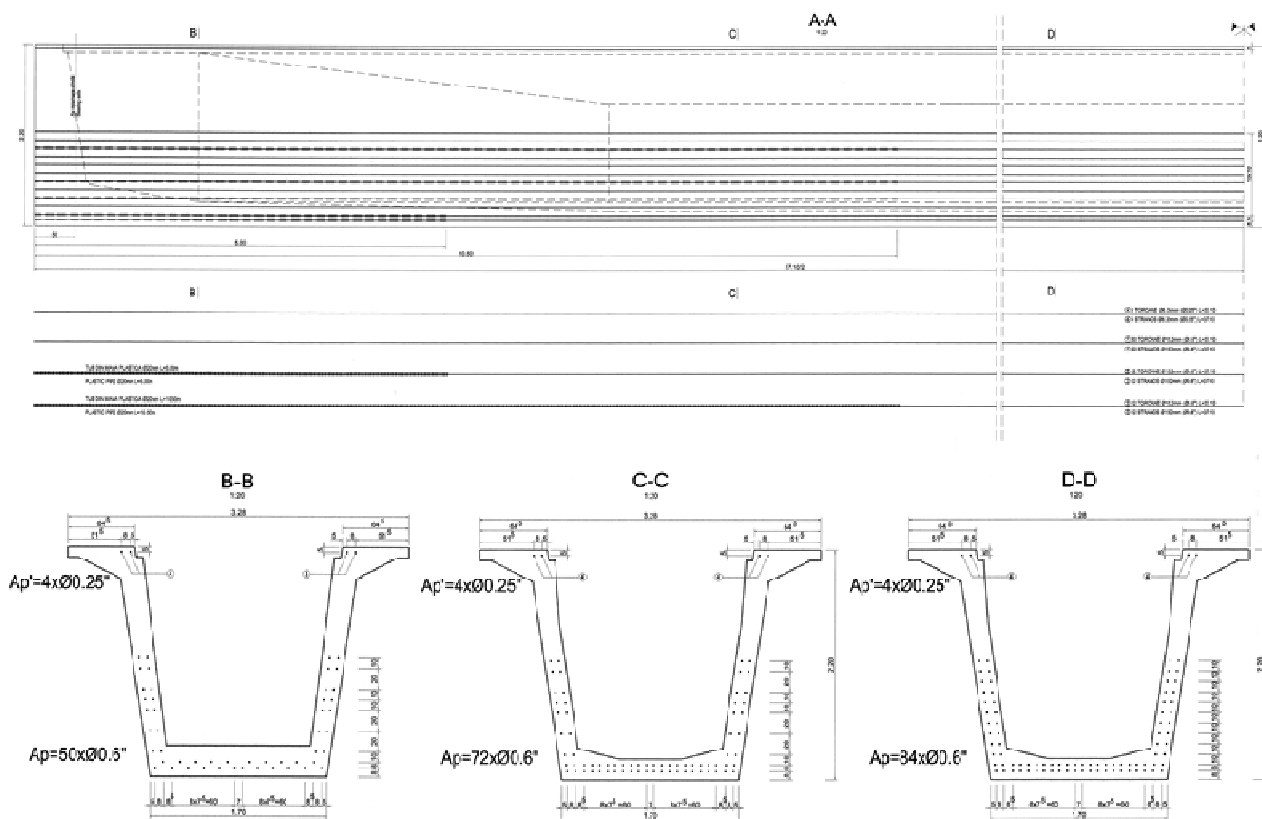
Precast U-beam of the monolithic-precast box girder assemble
